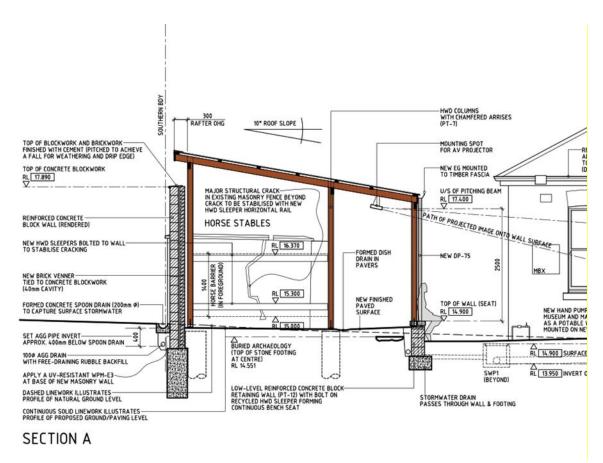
Cross-section of proposed boundary fence, drainage and covered interpretation station over the location of the c1862 Police stables.
